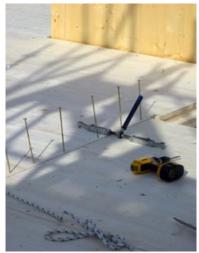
Self-drill woodscrews installed using light weigt tools Source: Trada
